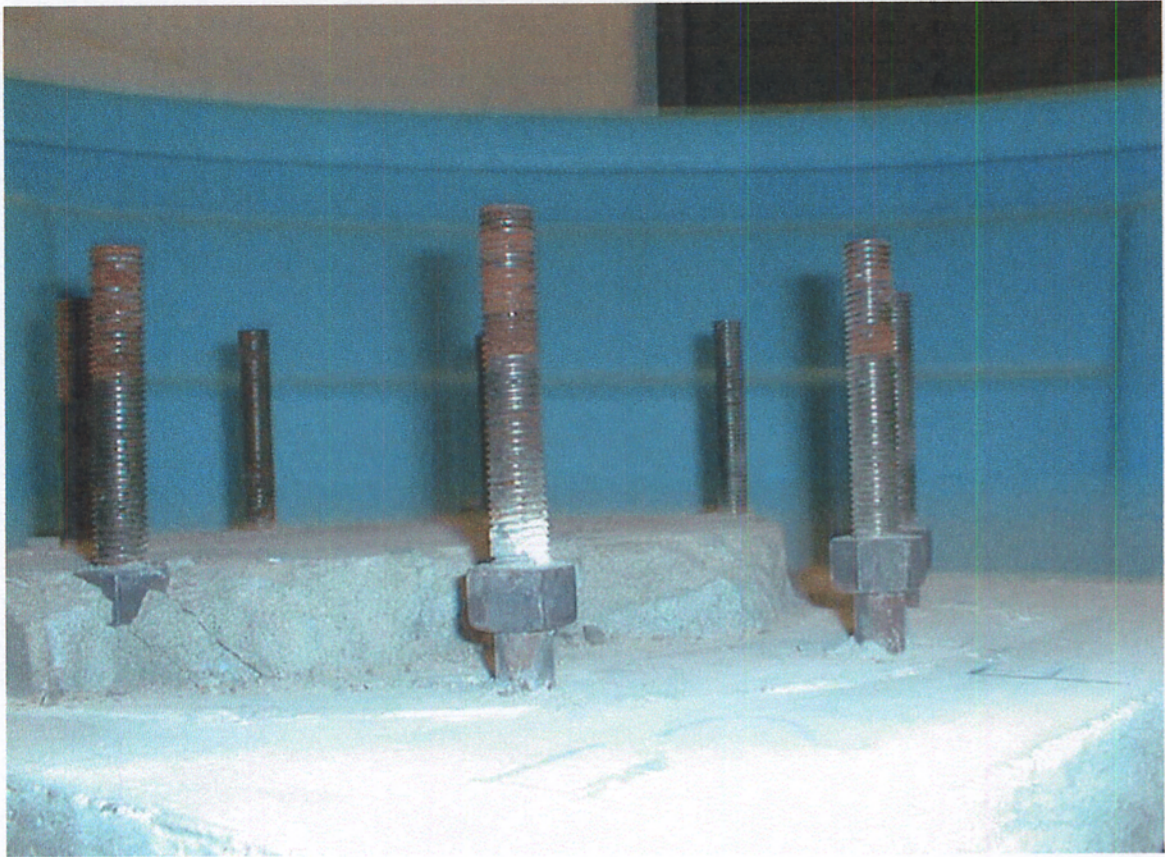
Picture of Anchor Bolts in Base Plate Assembly With Grout Type A for Grout Pad After 14 Weeks of Daily Wet-Dry Cycling of Salt Solution
